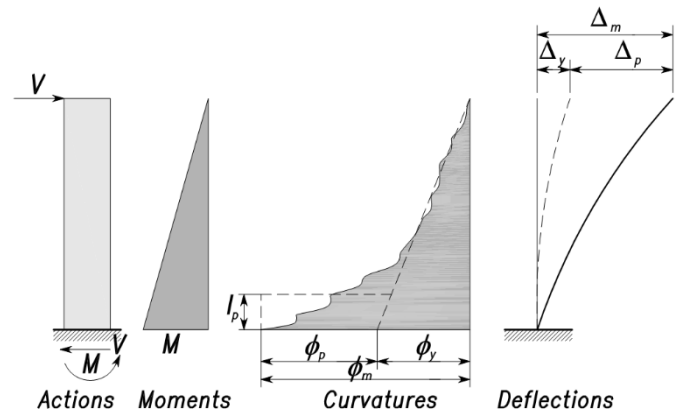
Moment, curvature, and deflection relationships for a prismatic reinforced masonry cantilever wall.
